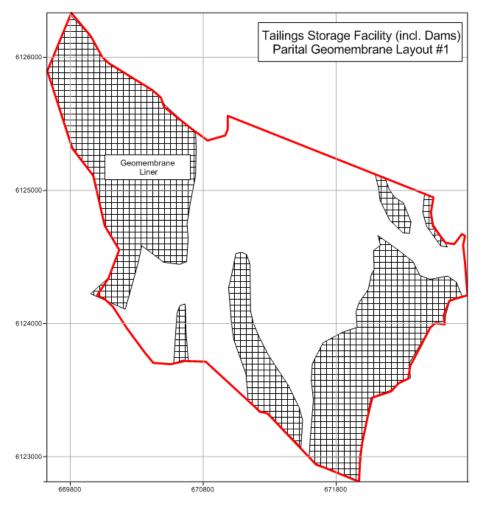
Tailings Storage Facility (incl. Dams) Partial Geomembrane Layout #1
